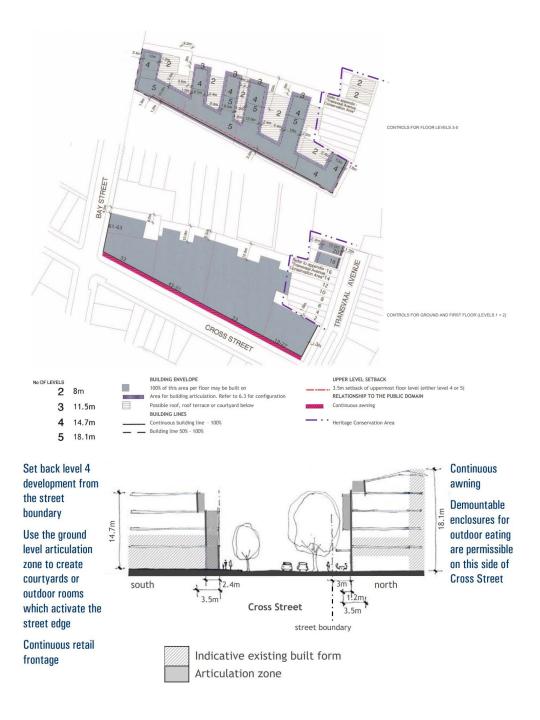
Building envelope and potential street character on Cross Street (source: Woollahra DCP 2015)
